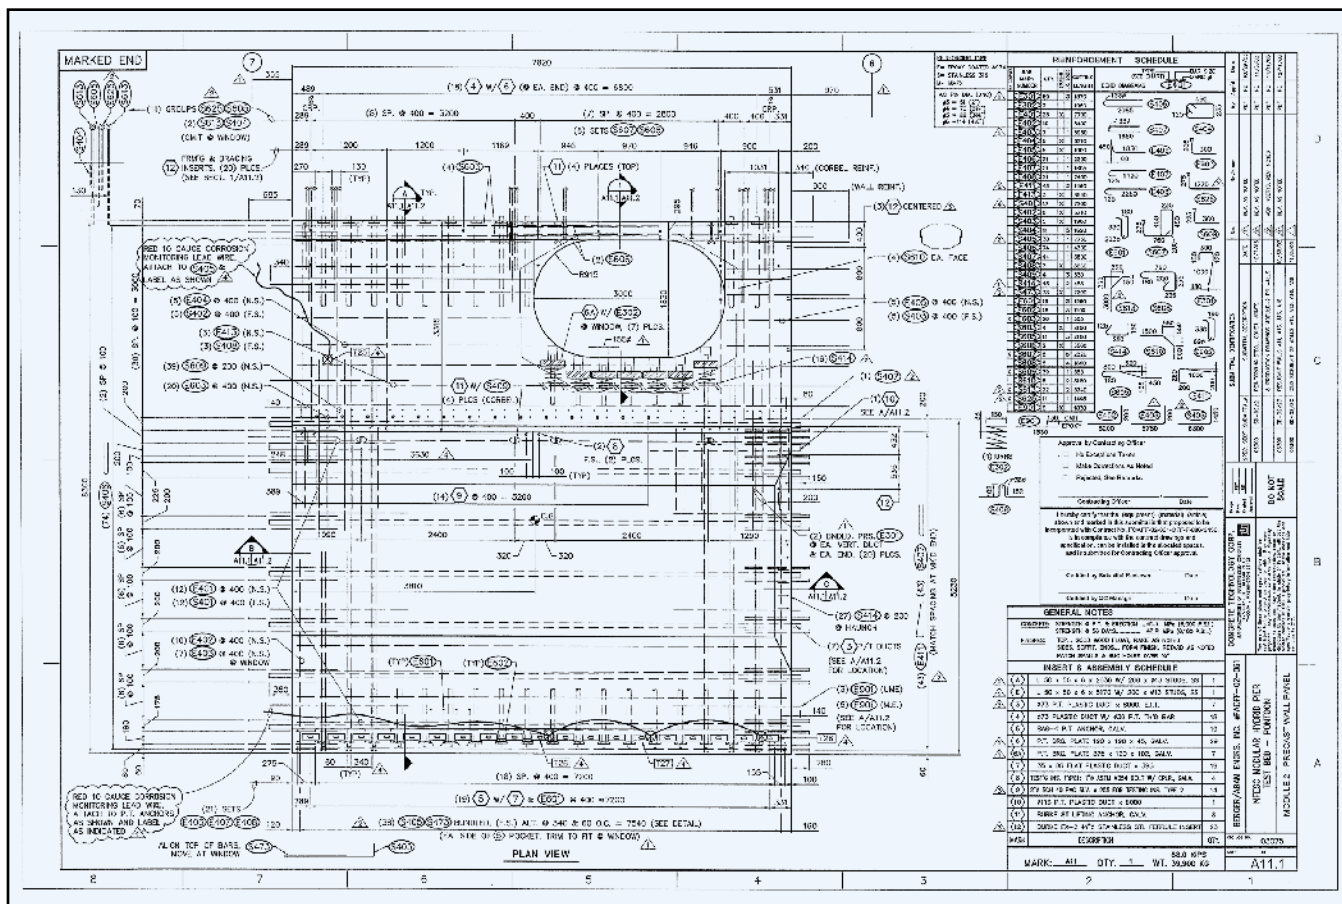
Plan drawing of Module 2 precast concrete wall panel.
